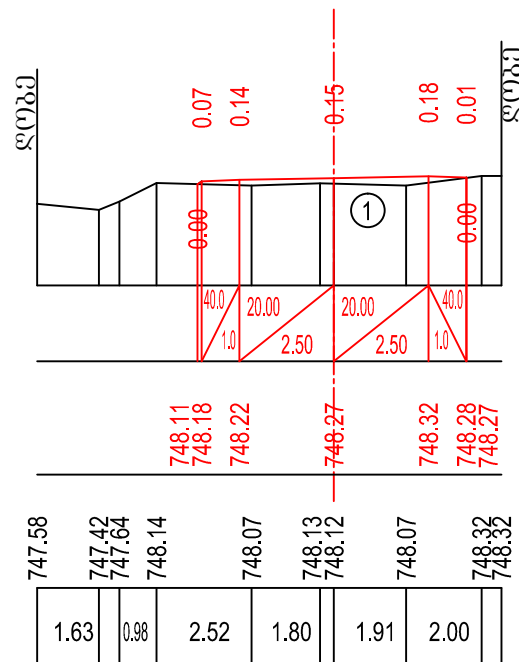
A cross-section diagram of a road with a 10% longitudinal slope. The diagram shows a 10m wide road with a 1% cross-slope. The road surface is divided into three sections: a 4m wide section on the left, a 2m wide section in the middle, and a 4m wide section on the right. The road is bordered by a 0.15m high curb on the left and a 0.19m high curb on the right. The road is labeled '1' in the center. The diagram is labeled 'Figure 1' and 'Figure 2'.
